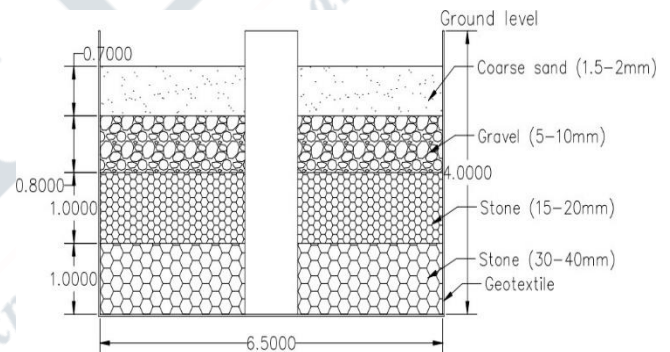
Sectional view of Recharge pit near Placement block (all dimensions are in m)
